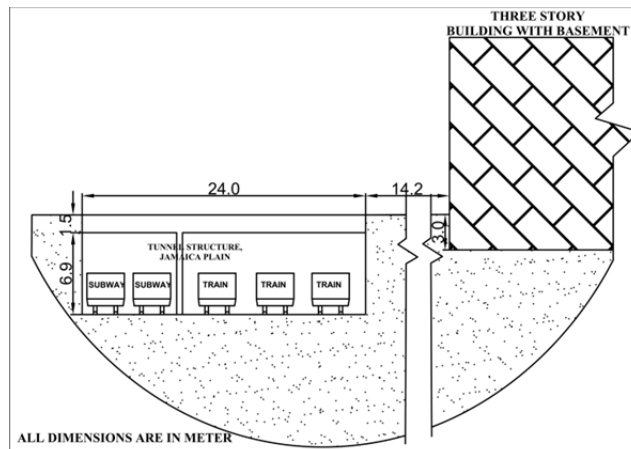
Measurement setups in Boston: Elevation
